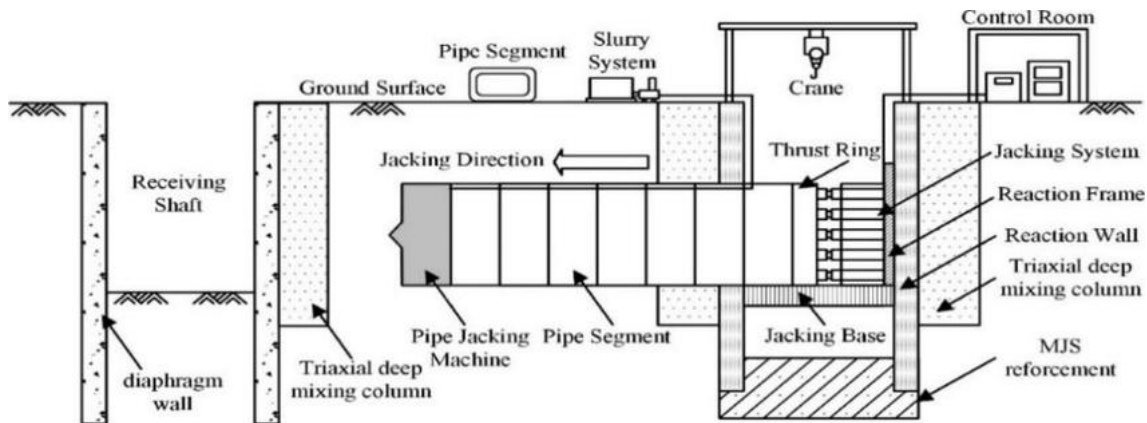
Cross-section of a typical pipe jacking construction method¹
